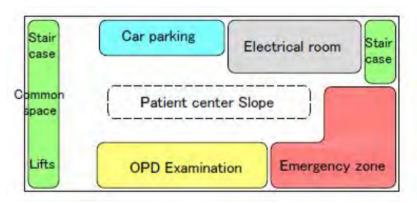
Zoning of the New OPD Building: Ground Floor
